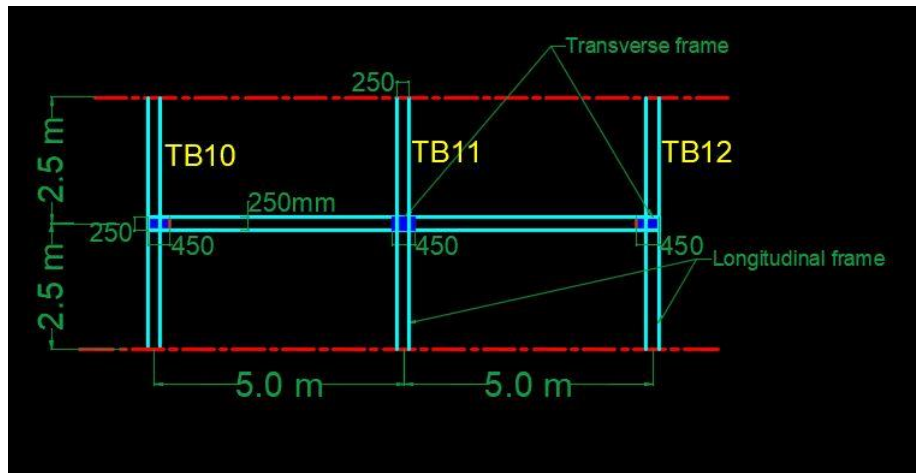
(d) Plan showing the Columns and Beams at “Roof” of the Plane Frame
